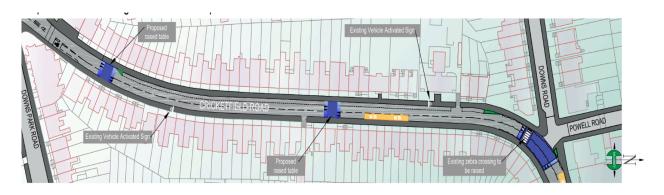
Proposed traffic calming measures and improvements on Cricketfield Road
